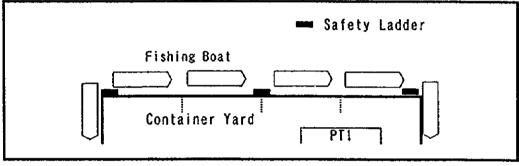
Layout Plan of Fenders and Ladders
